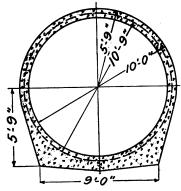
Reinforced Concrete Conduit, on Los Angeles Aqueduct, Cal.
